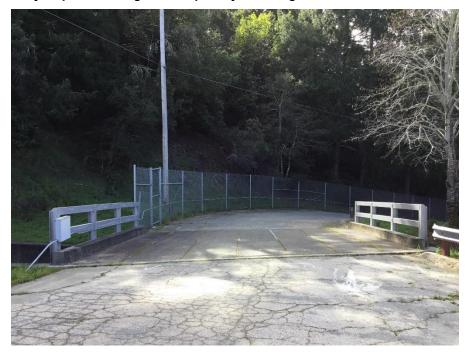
Bridge Over Spillway, Looking East. February 20, 2018. (IMG016)
